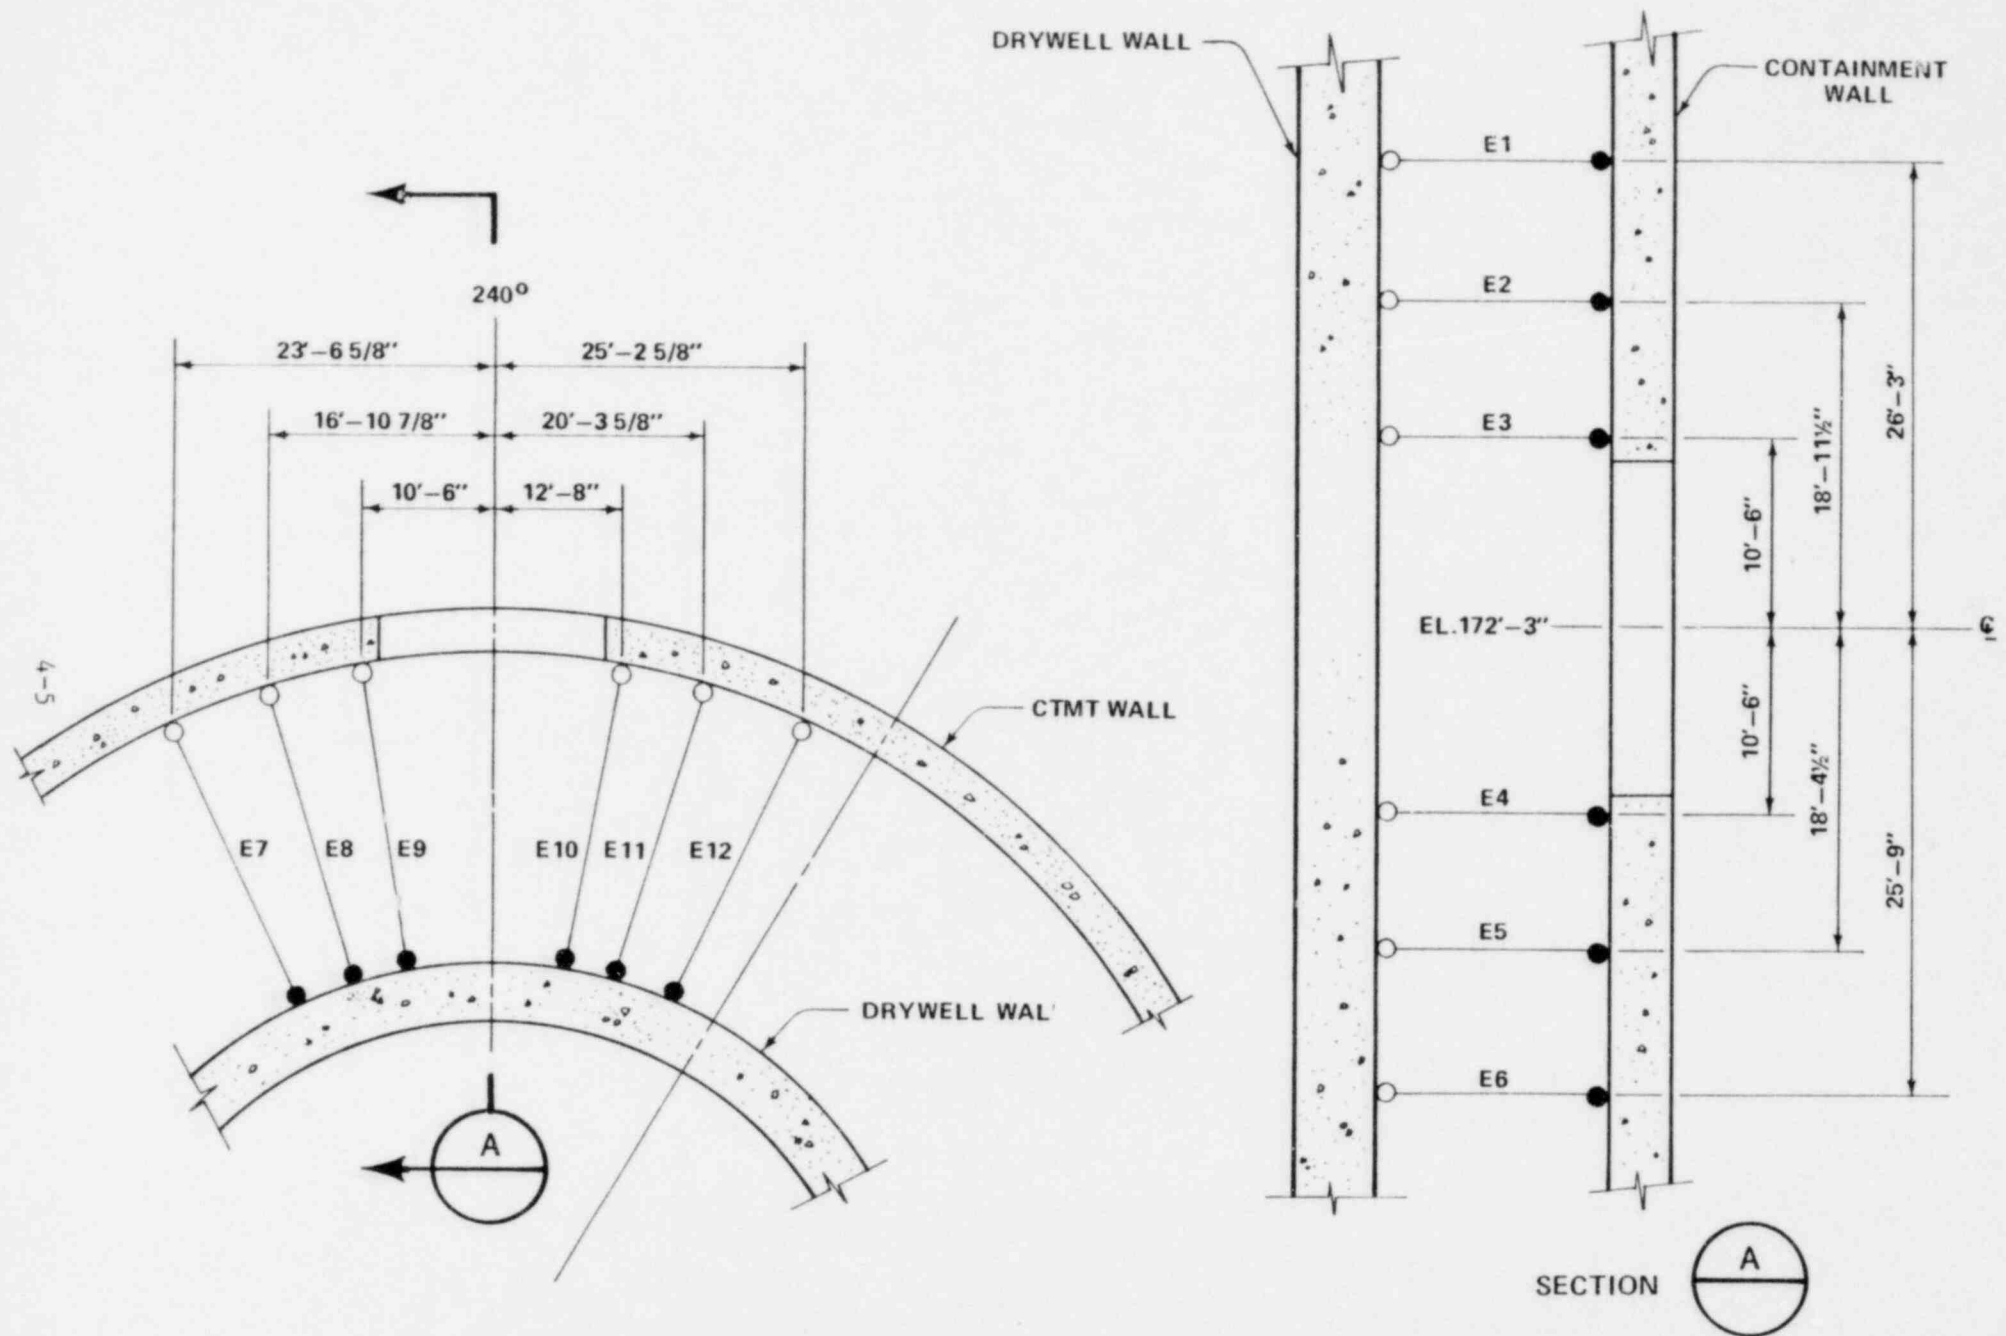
TAUT WIRE EXTENSOMETER LOCATIONS - EQUIPMENT HATCH
